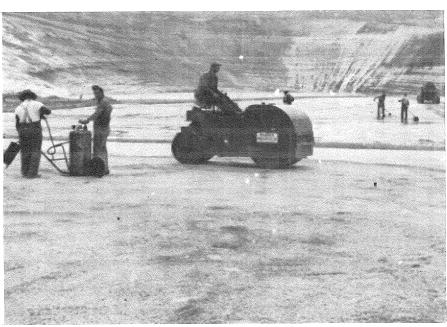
Rolling loose pea gravel into asphaltic membrane.
